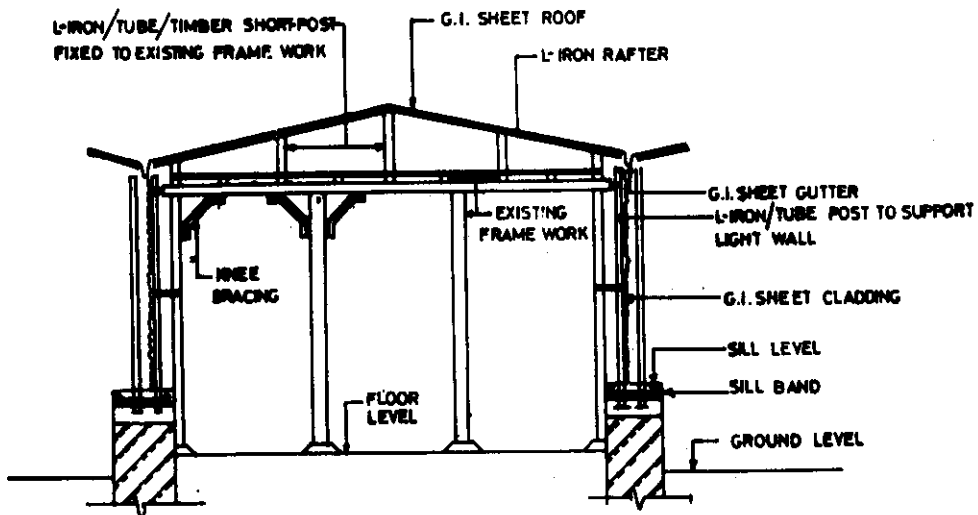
RECONSTRUCTION WITH LIGHT WALLS AND ROOFS
